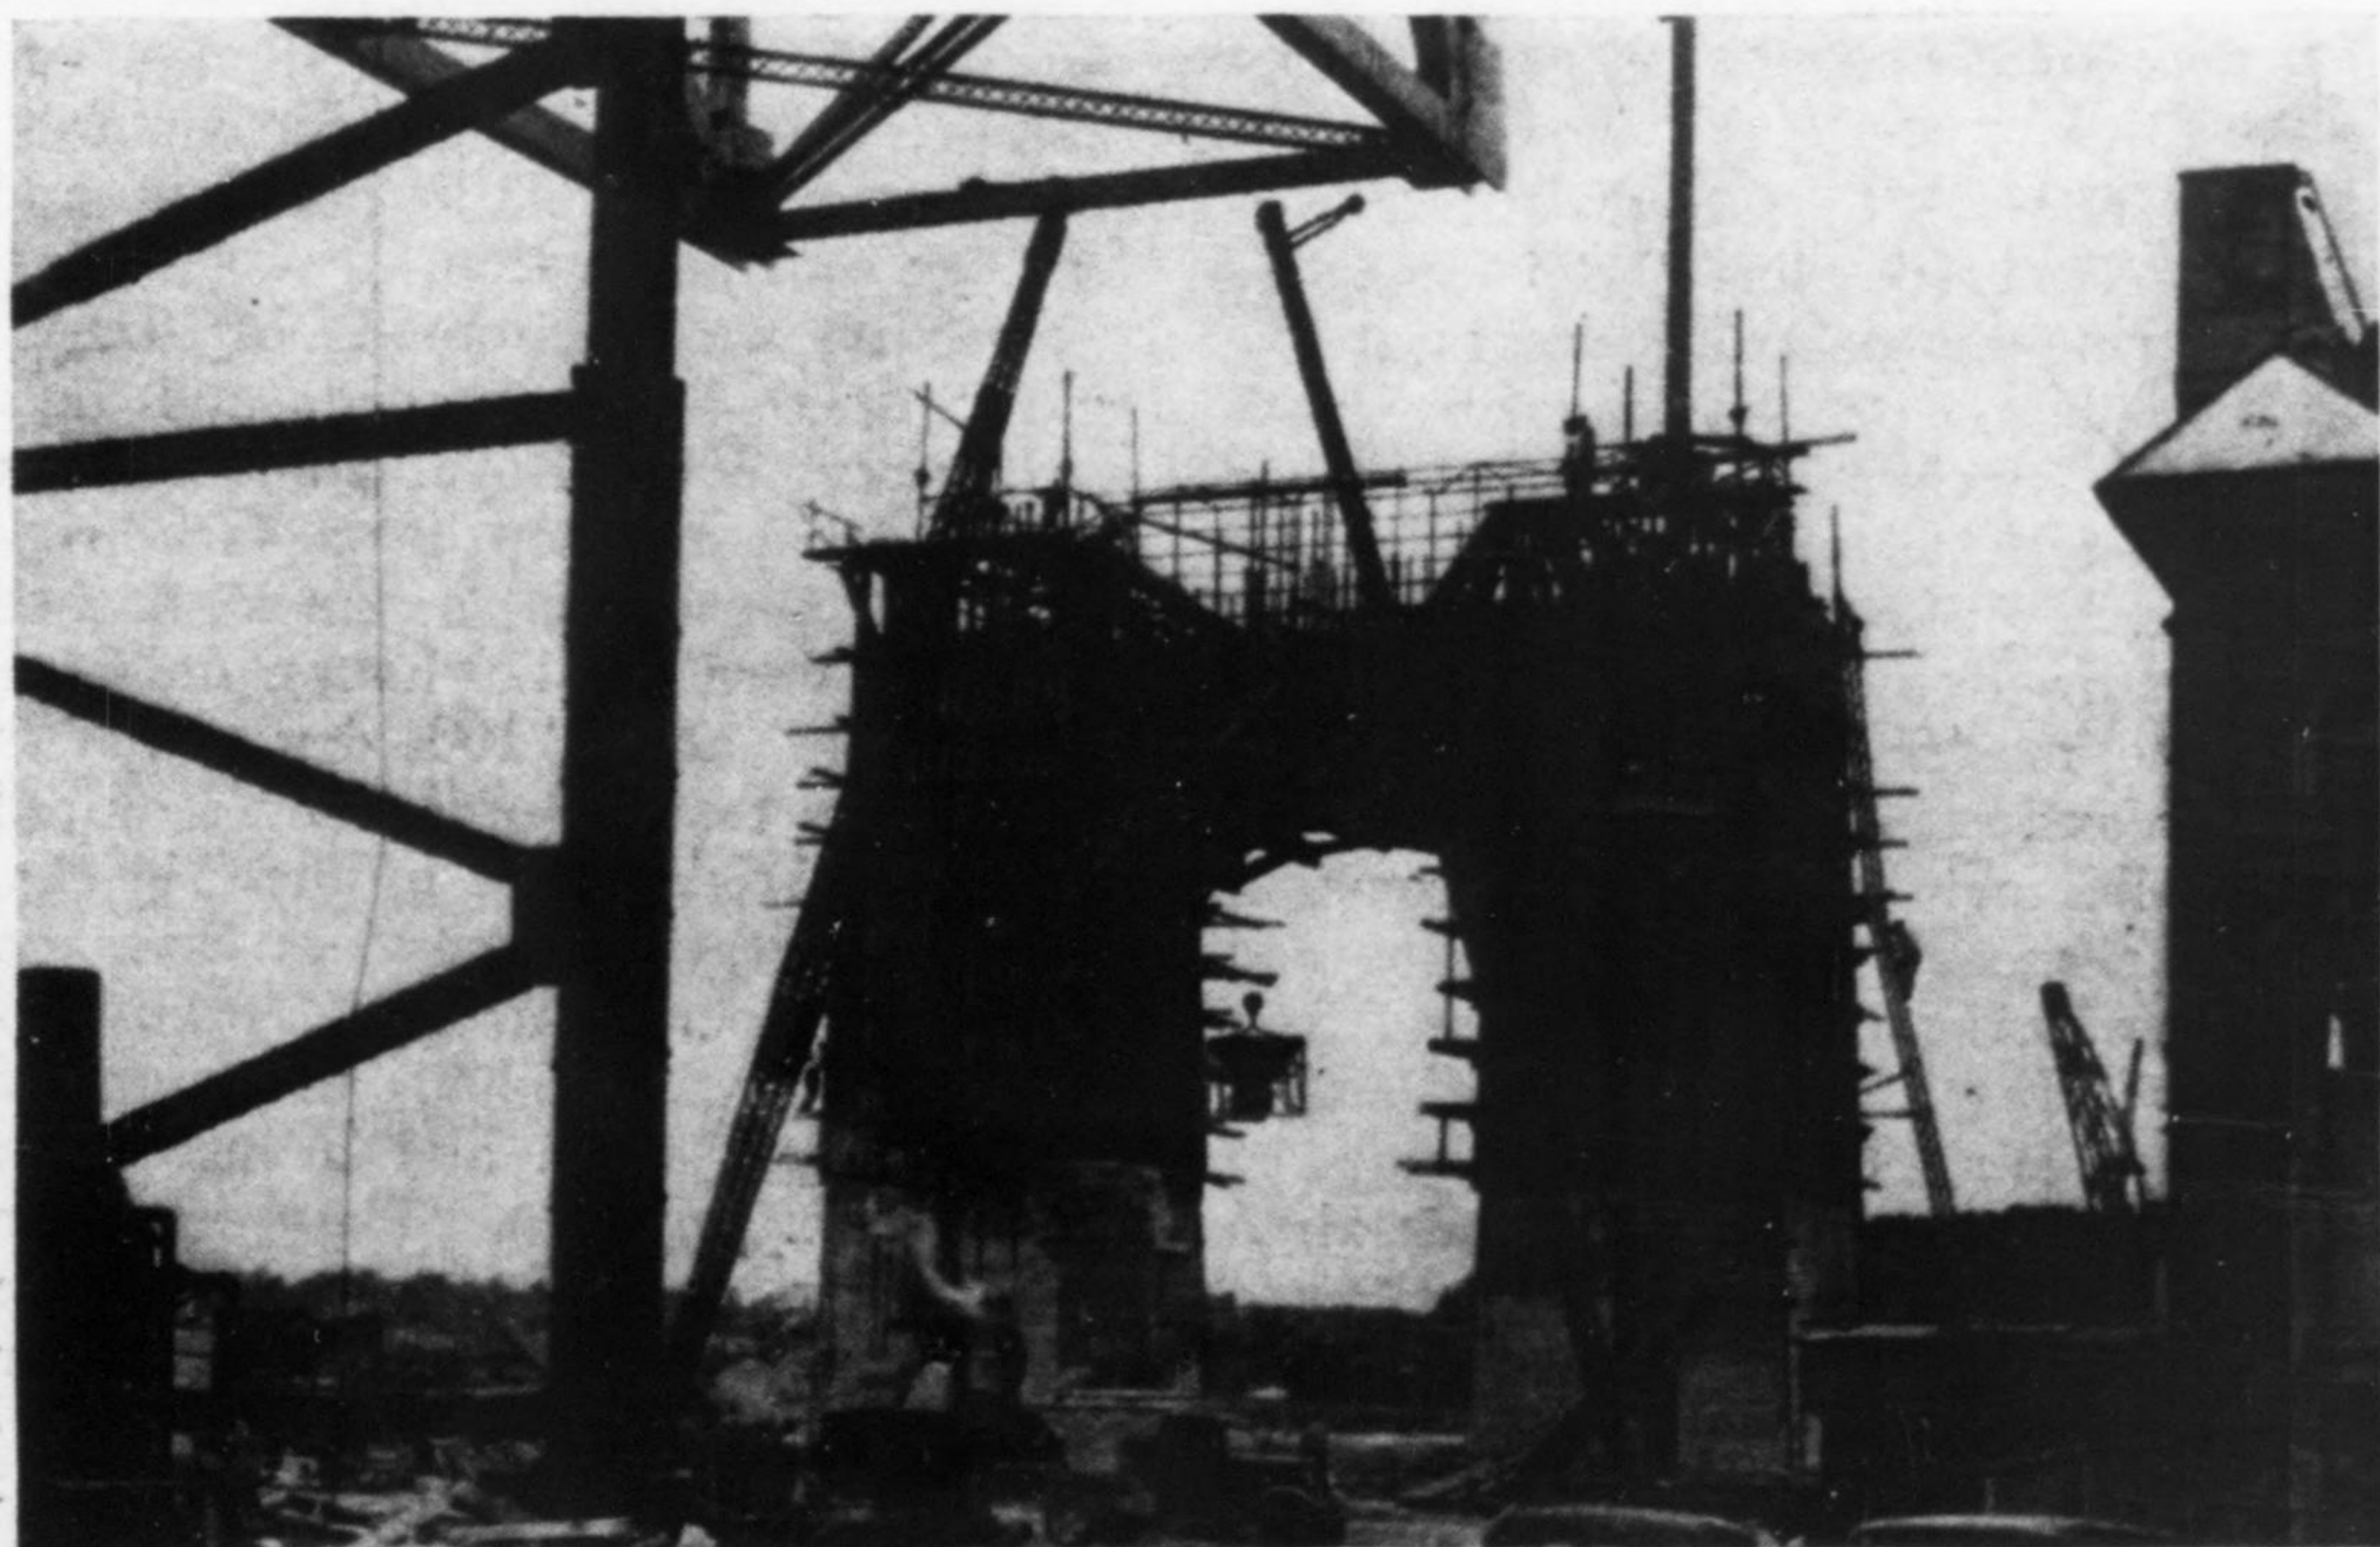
CONCRETING the South Bourne main pier. The two pavers are charged by the small tip-over-body trucks that shuttle between the pier and the batching plant, a corner of which shows at the right.
